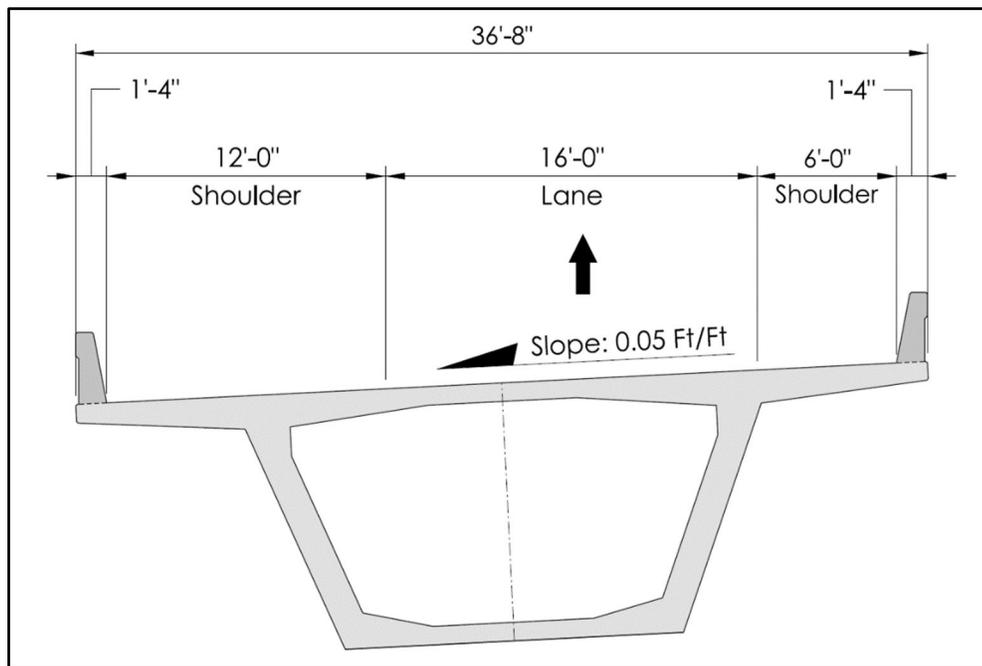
Proposed Bridge 4 Typical Section, Segmental Option
